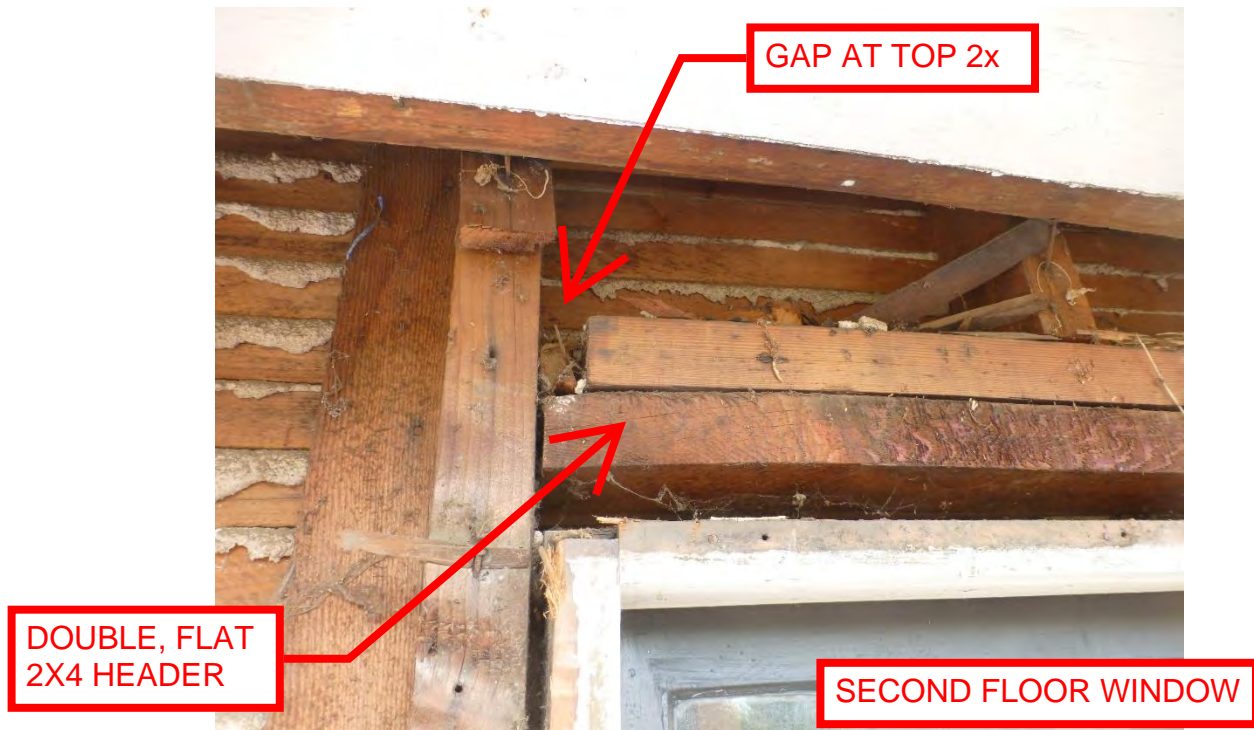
SOUTH ELEVATION – HEADER CONDITION
